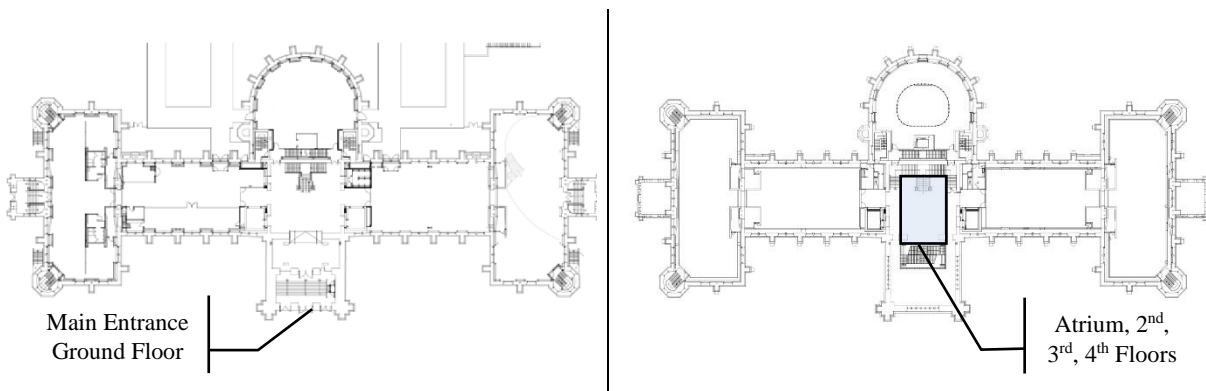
Ground Floor and 2nd, 3rd and 4th Floor General Layout
